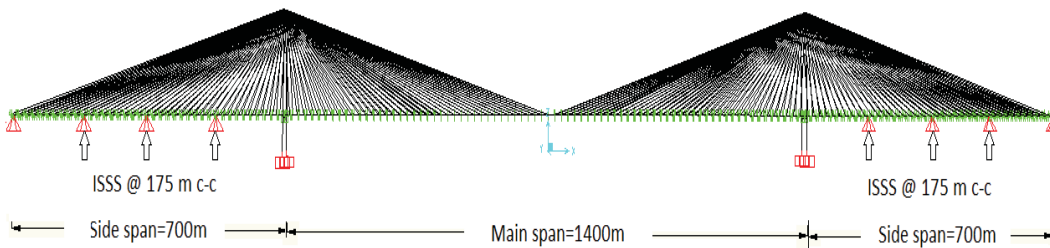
Cable stayed bridge with three ISSS in side span at 175m c-c
